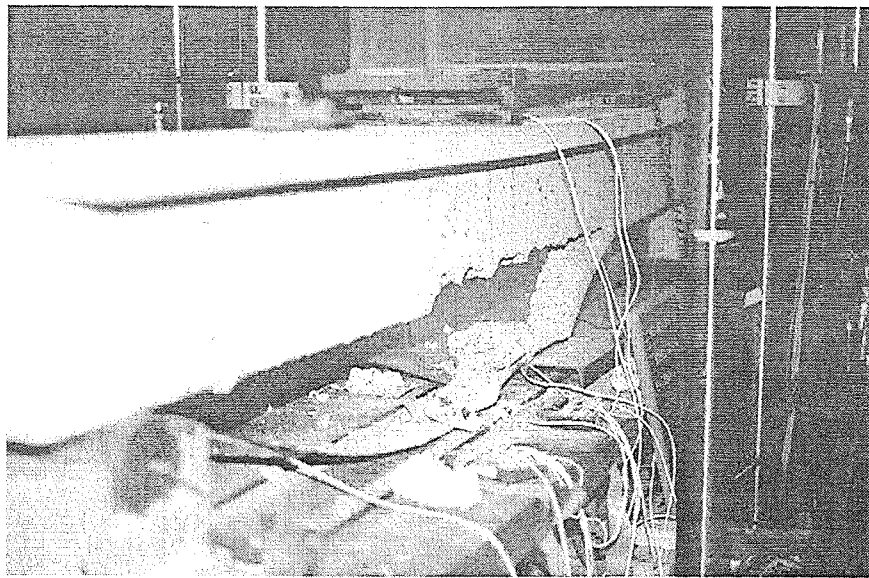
Interfacial shear failure of concrete in Beam No. 10.
